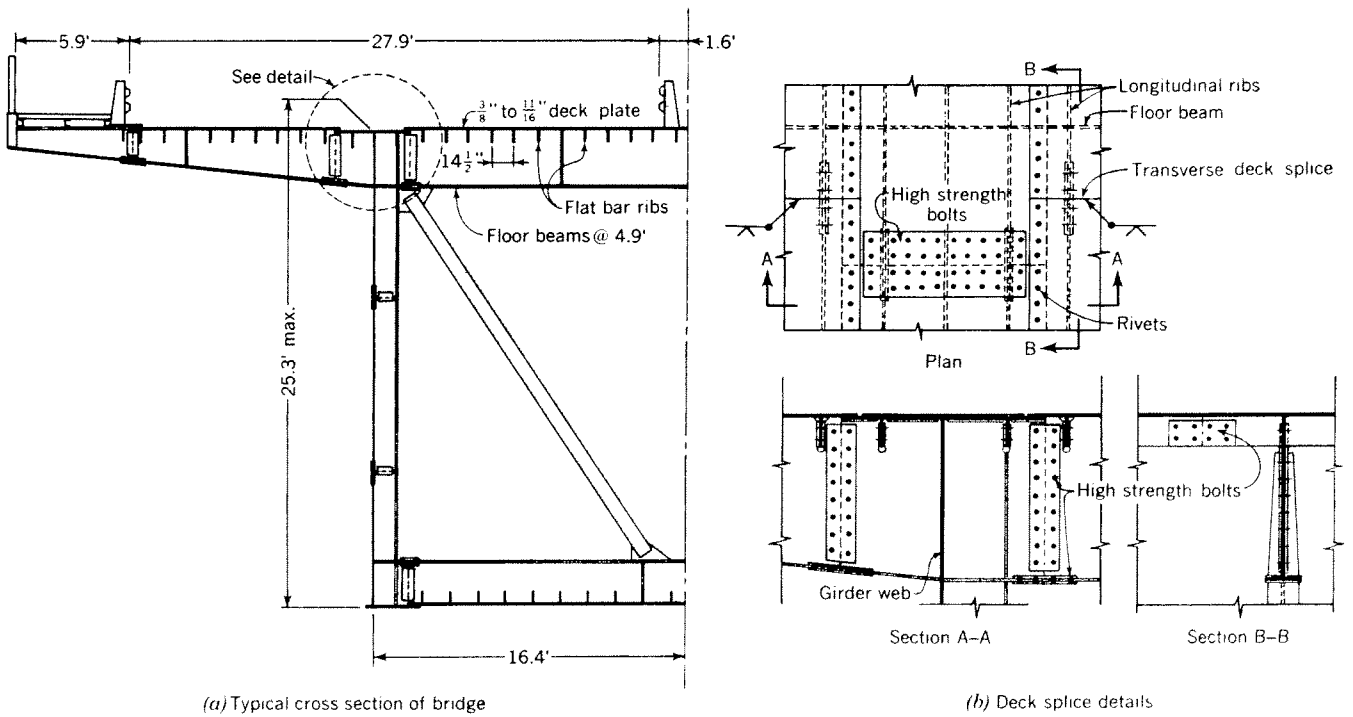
Cross section and field splice details of the Europe Bridge over the Sill Valley, Austria (266-354-650-354-266-266 ft. spans [58])
